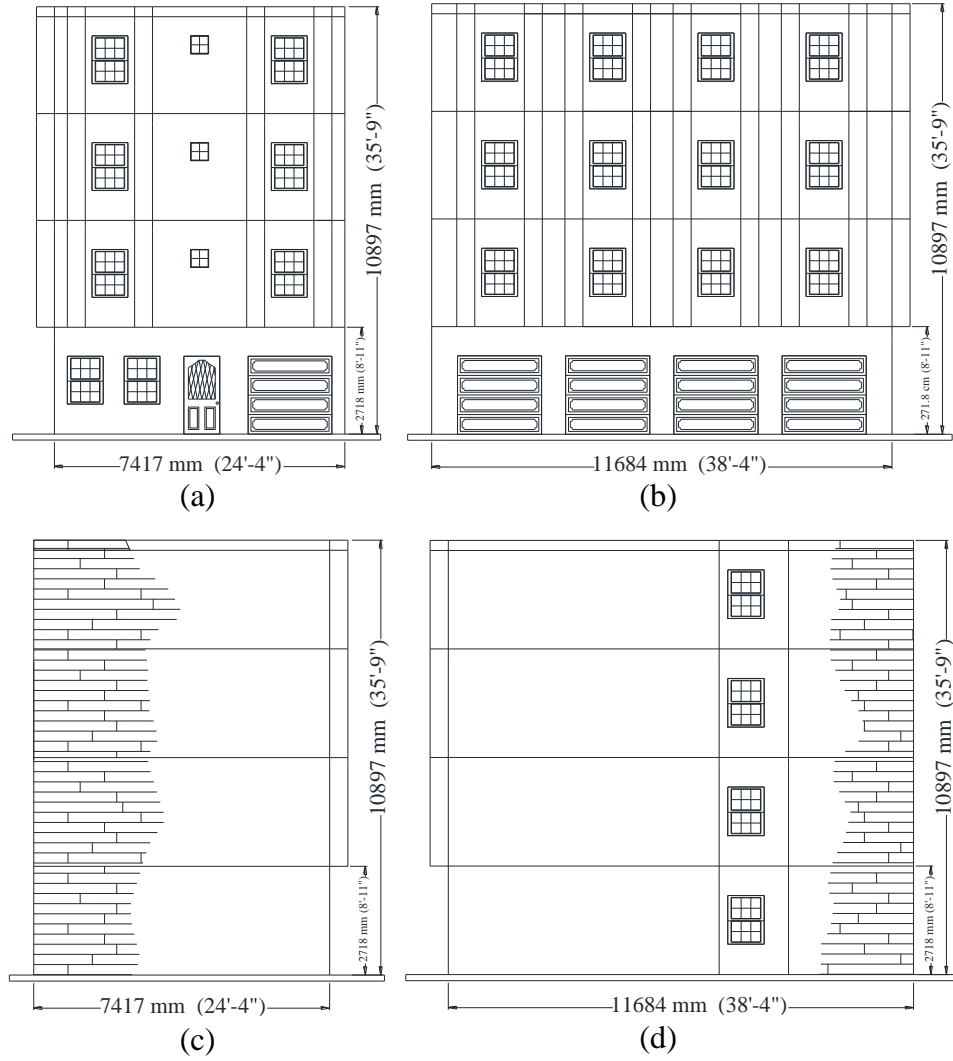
Elevation views of the test building: (a) East view, (b) South view, (c) West view, (d) North view.
